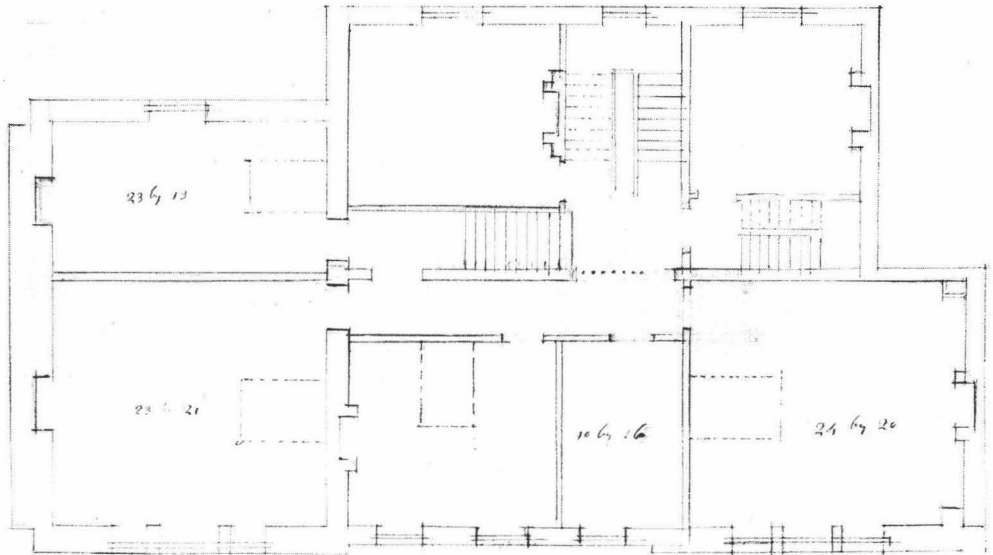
Robert Adam, first-floor plan of Marlborough House, 1786, pen. (Source: Sir John Soane's Museum. North is to the right.)
